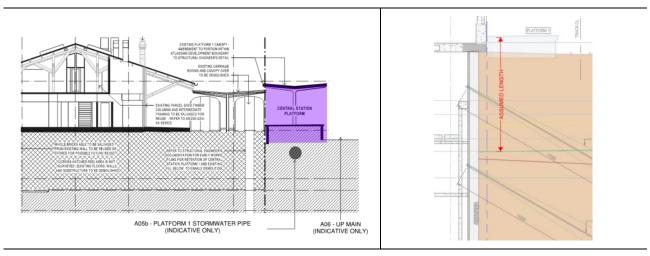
Cross-Section Elevation View of Platform 1 (BVN Dwg, AR-23D-GXX-02[5]) With Assumed Footing Depths for Characteristic Height
